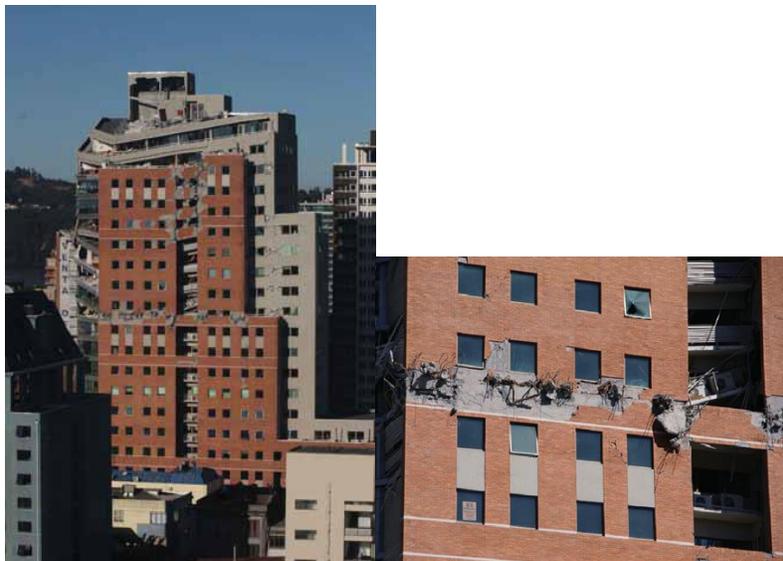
Failures suffered by upper storeys of buildings: Concepcion, Chile [2.16]
